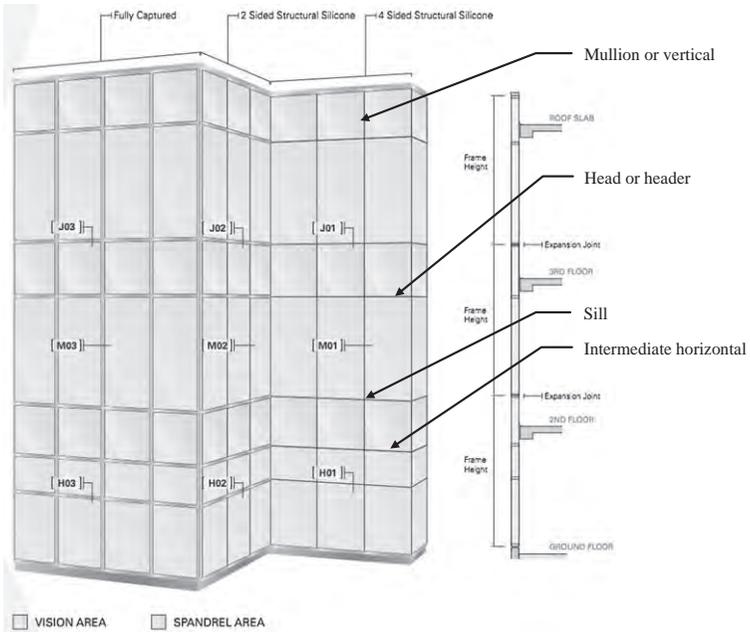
Typical curtain wall elevation featuring SSG and capped glazing
